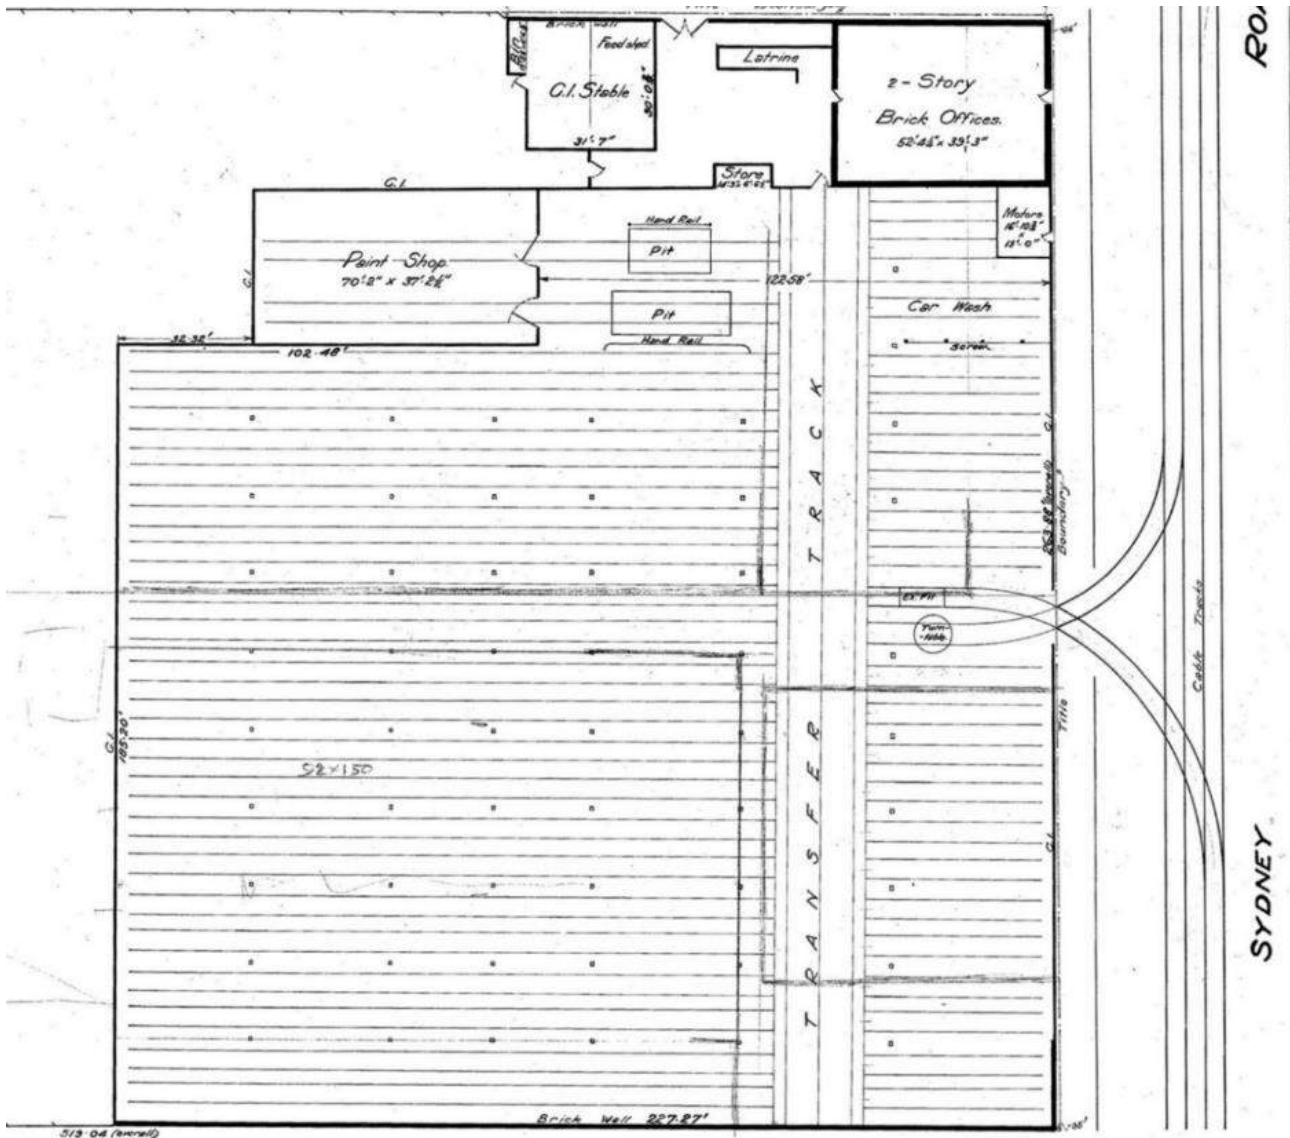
Detail from MMTB's 1931 plan of the Sydney Road Cable Car Depot, showing the car shed and adjacent office allotments (Jacobs 2020)
